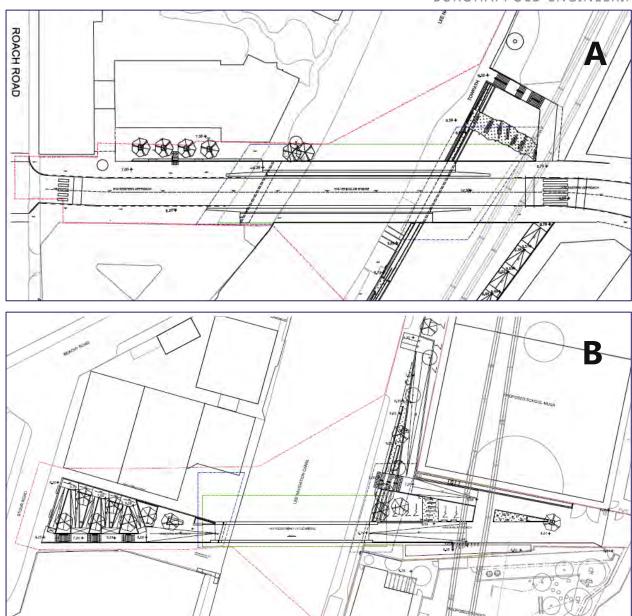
2: Plan view of proposed (A) H14 Bridge, and (B) H16 Bridge (see Appendix A for more details)
